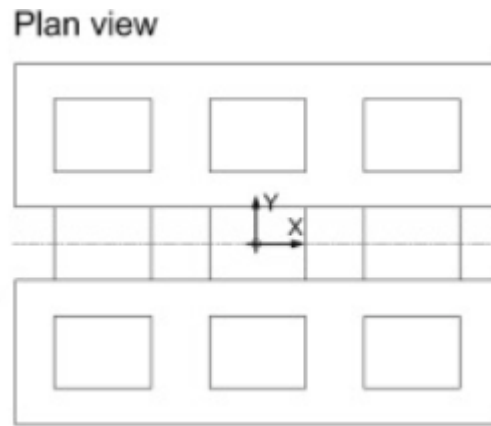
Plan view of twin-hull MFS (From Wang et al., 2019)
